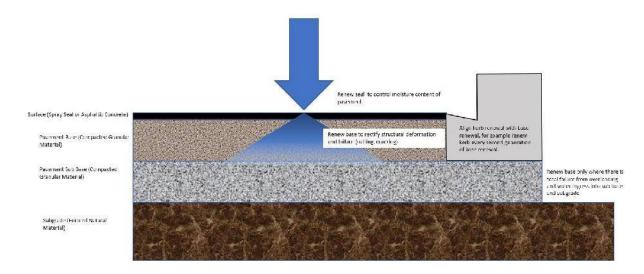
Road Pavement Renewal for Light Traffic Pavements (sub base is never renewed)
